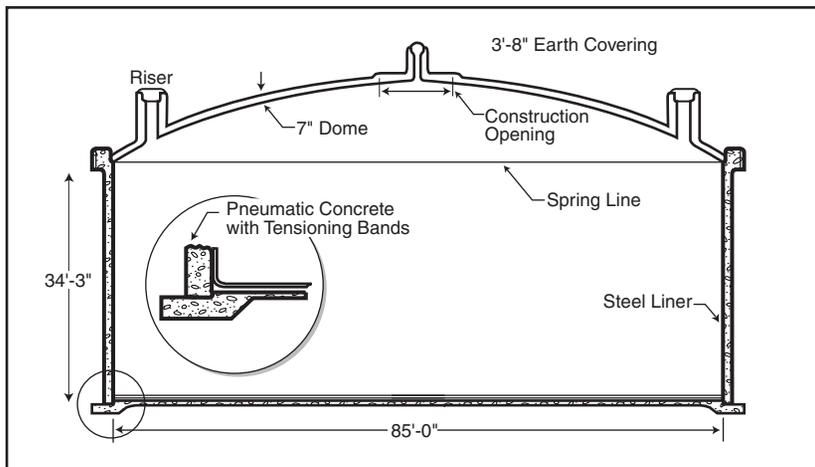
C. Uncooled Waste Storage Tank, Type IV (Prestressed concrete walls, 1,300,000 gallons)
